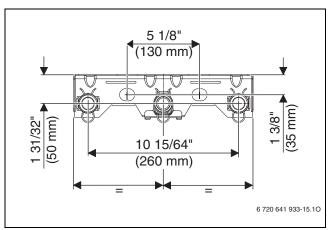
Hydraulics connection plate for heating boiler ZBR...-3A (top view)
